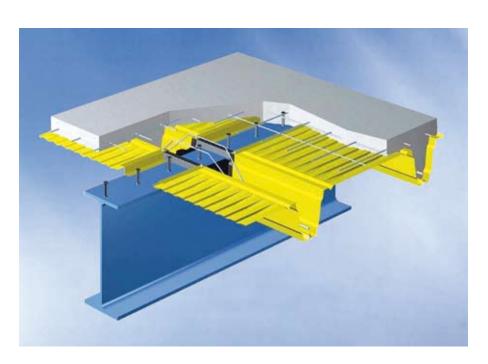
Illustration of Hoesch Additif flooring system supported by steel beams
